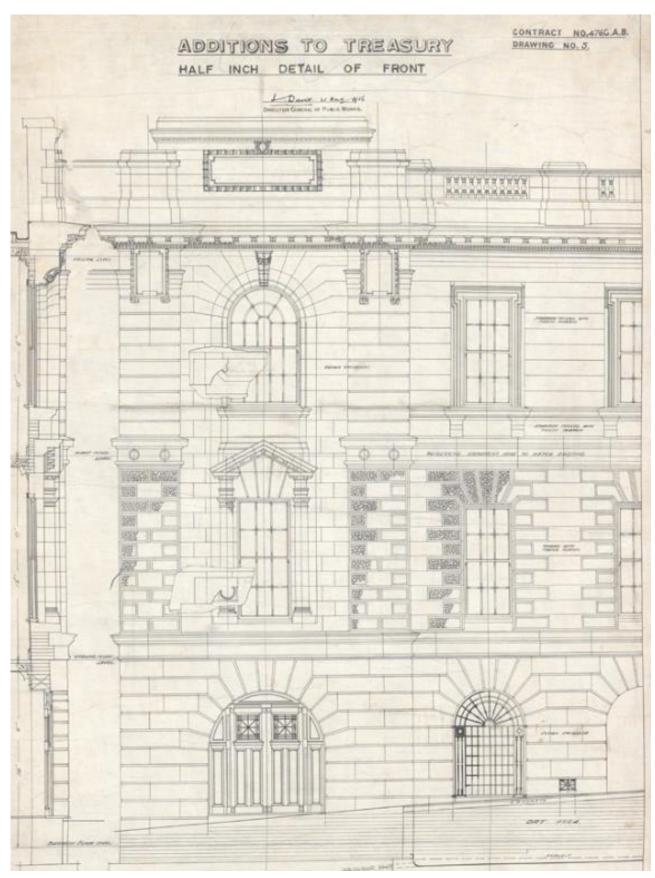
Additions to Treasury by George McRae in 1916 (Half inch detail of front – Bridge Street elevation) showing elevation as constructed
